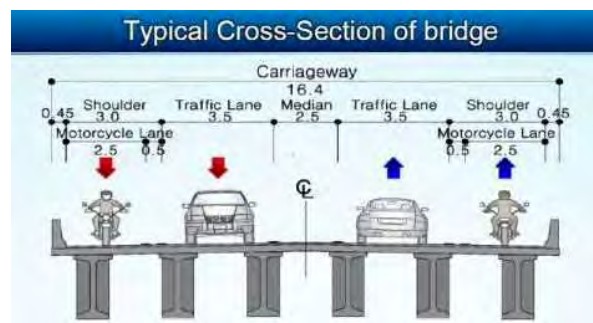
Typical Cross Section of Bridge of RR 3
